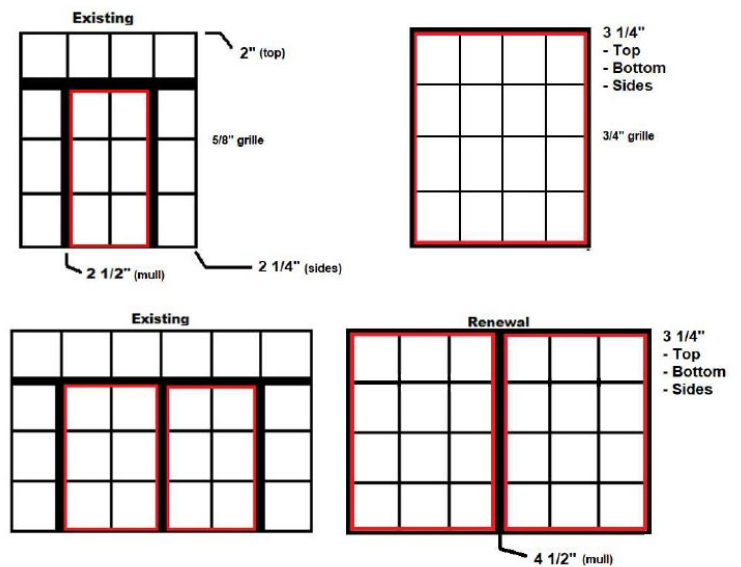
, by Applicant: This illustrates existing (left column) and proposed (right column) dimensions of the mullion pattern for the casements
